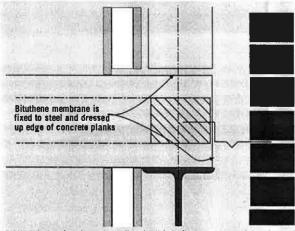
Section through the floor/wall junction. Workmanship on the roof junctions had to be well above average.
